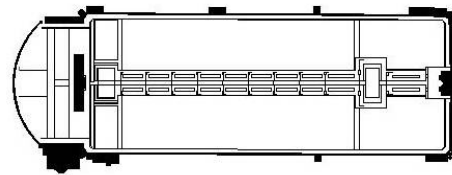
(Plan) Shahzadeh garden, Mahan, Iran
